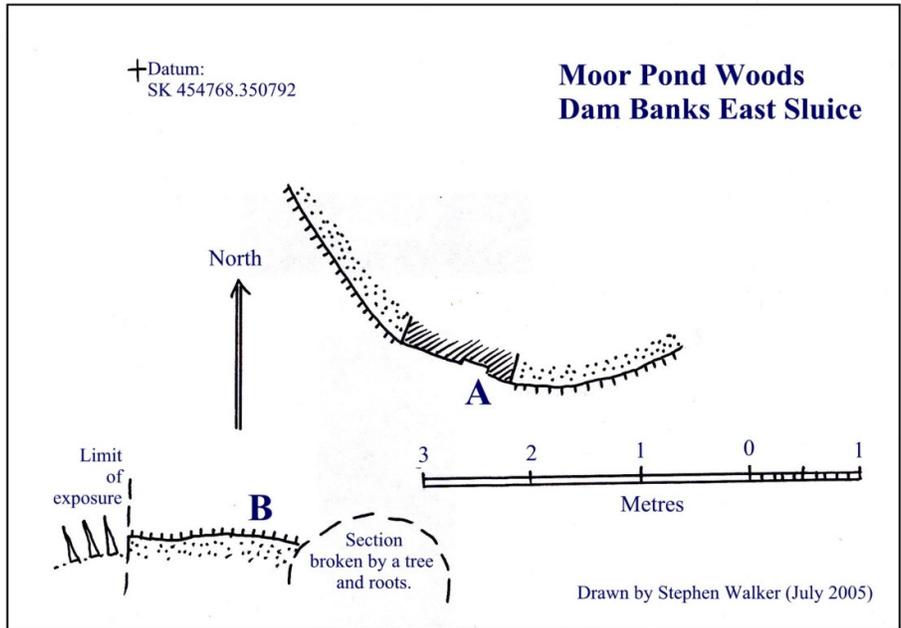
Plan of Dam Banks East Sluice, as revealed by excavation July 2005
